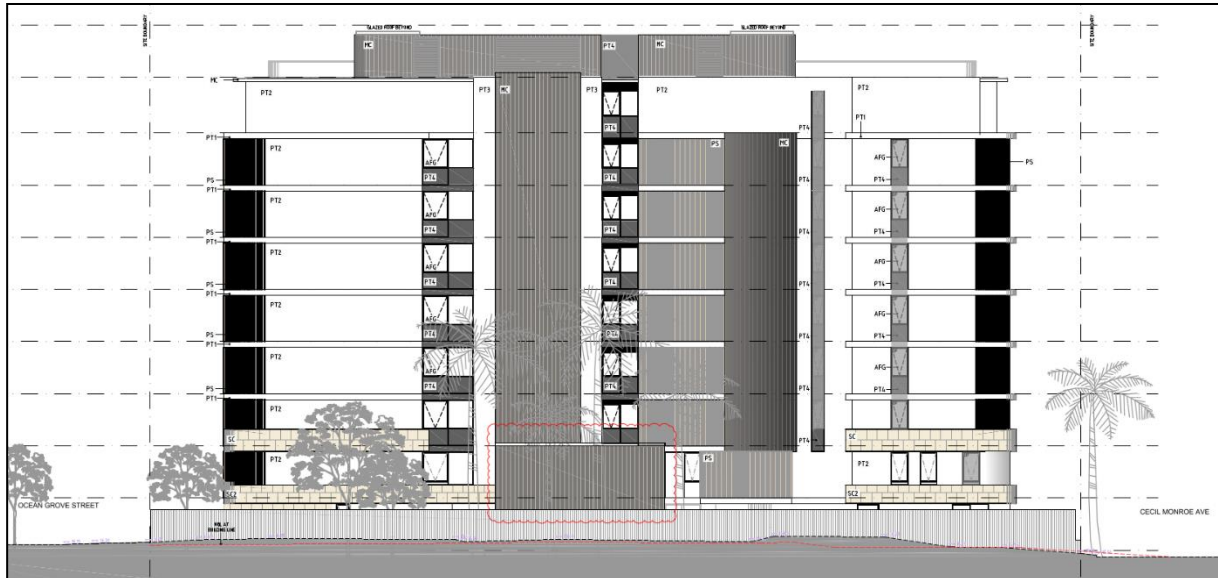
Proposed western elevation deleting the green wall (source: Applicant's revision 1 plans)
